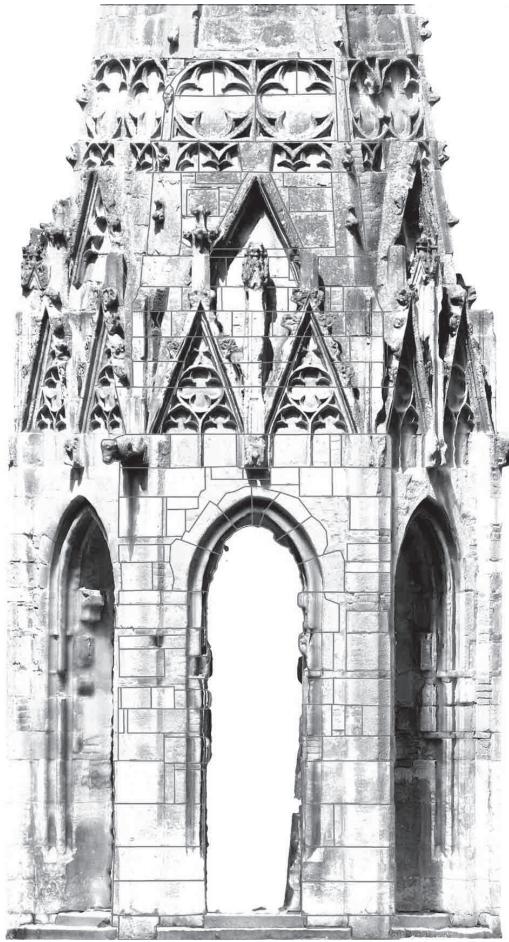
orthophoto of the garden pavilion with joint structure. By author
